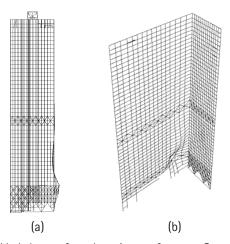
Buckled shape of north perimeter frame at Stage 4 in global model (a) view towards west (b) partial view towards northeast
